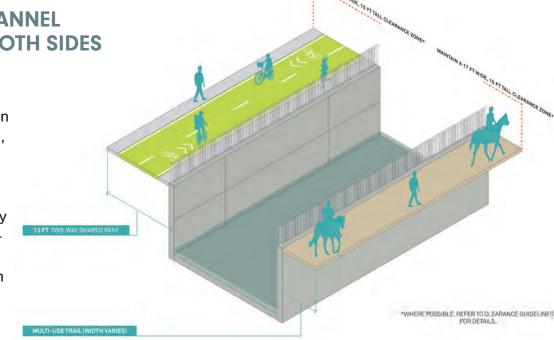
Example with 13 feet greenway on one side of channel and separate trail on opposite side
